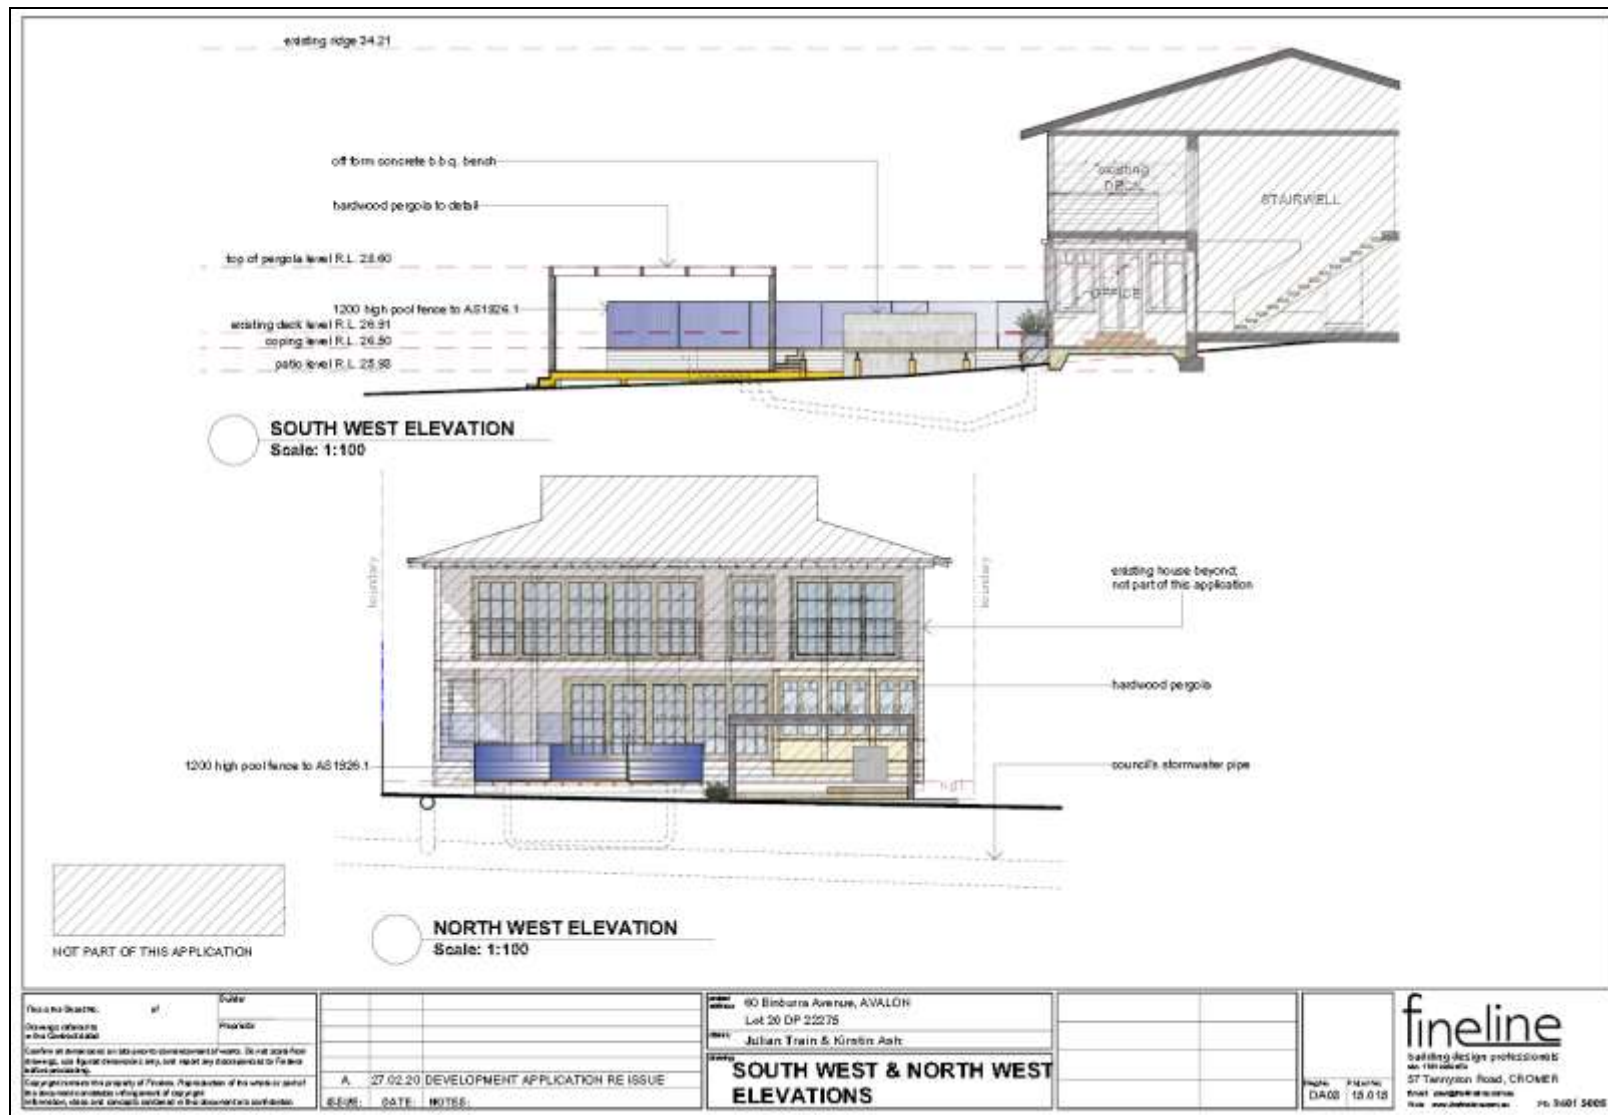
Illustrates proposed Site Plan, Pool & Pool Patios, Pool Sections & South West & North West Elevations..
